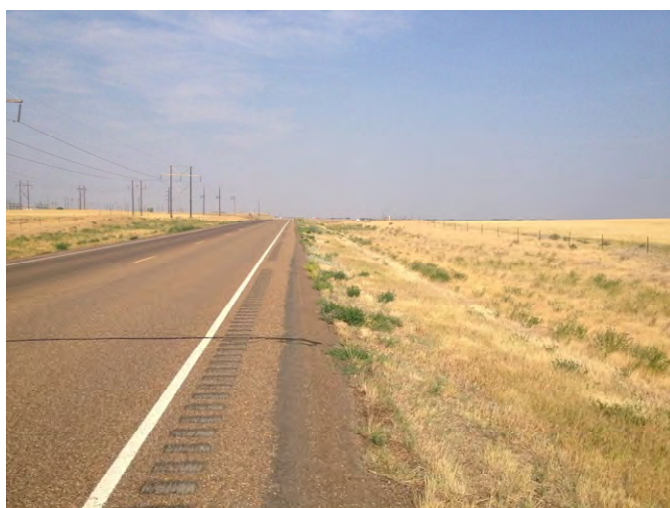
Segment 6, RP 586.9±, looking eastbound.
